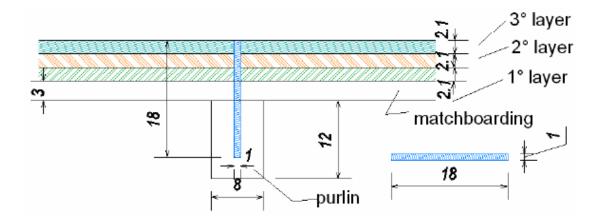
Scheme of the intervention on the roof diaphragm, consisting in the application of multilayer panels and chemically anchored steel connectors
